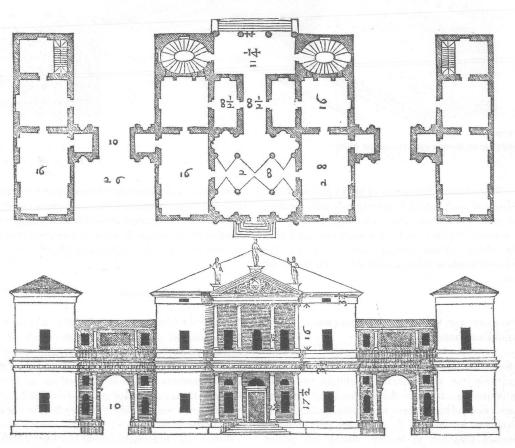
Plan and prospect of Pisani Villa (Palladio 1570.
